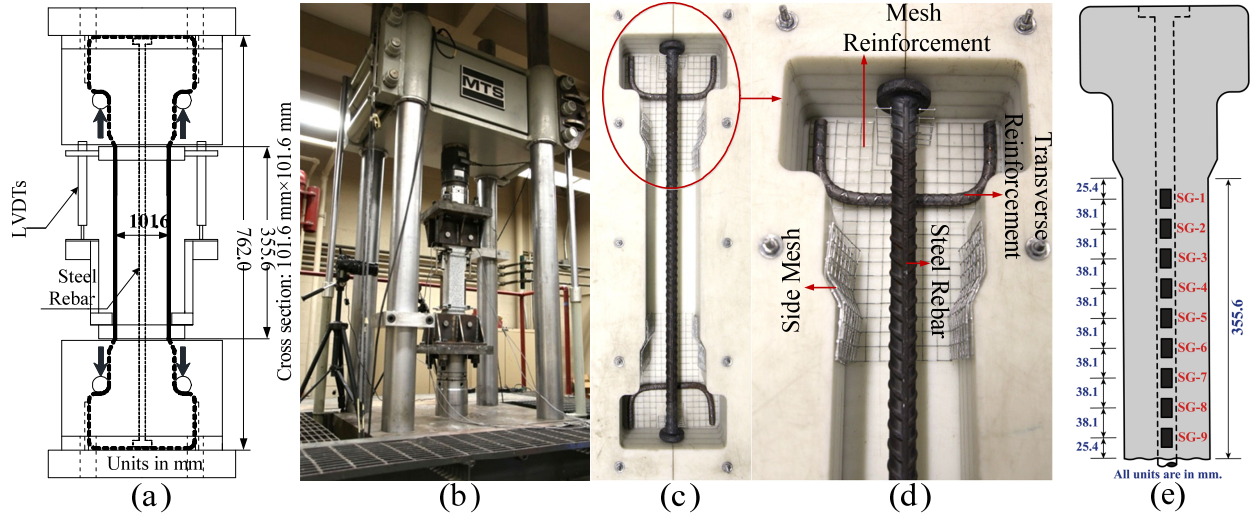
(a) Schematic and (b) actual design of the tension-stiffening test setup, (c) and (d) reinforcement details of the tension-stiffening specimens, and (e) strain gauge locations for gauged tension-stiffening specimens.
